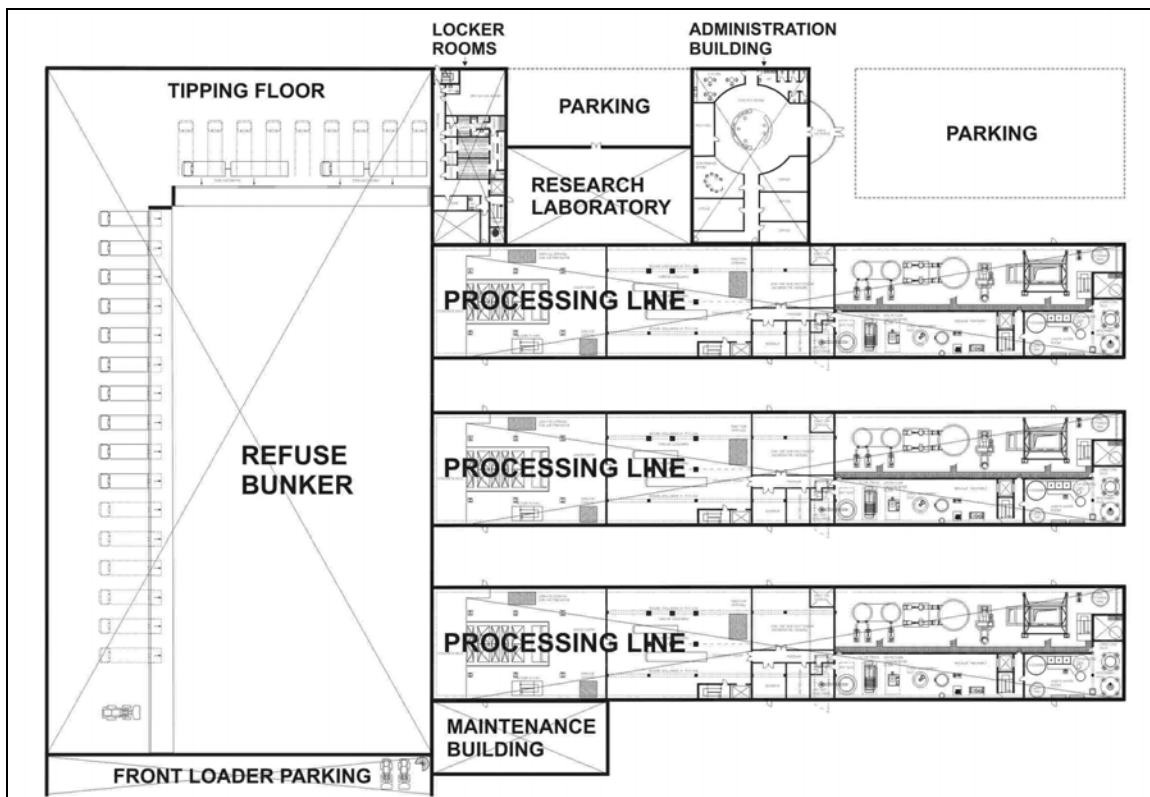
Possible plan of the proposed WTE plant (based on Reference 23).
